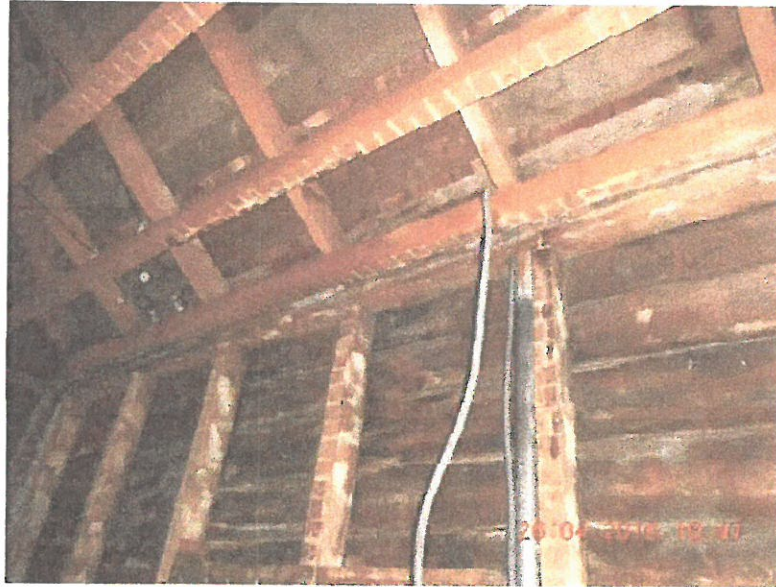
Inadequate load path, rafters bearing on ceiling joist
